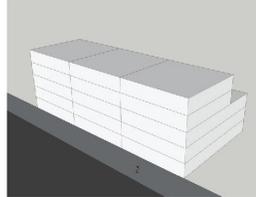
Design a rooftop outdoor amenity space to be highly visible and easily accessible from the public way. The stairs and elevator should be exterior or located in a vestibule.
